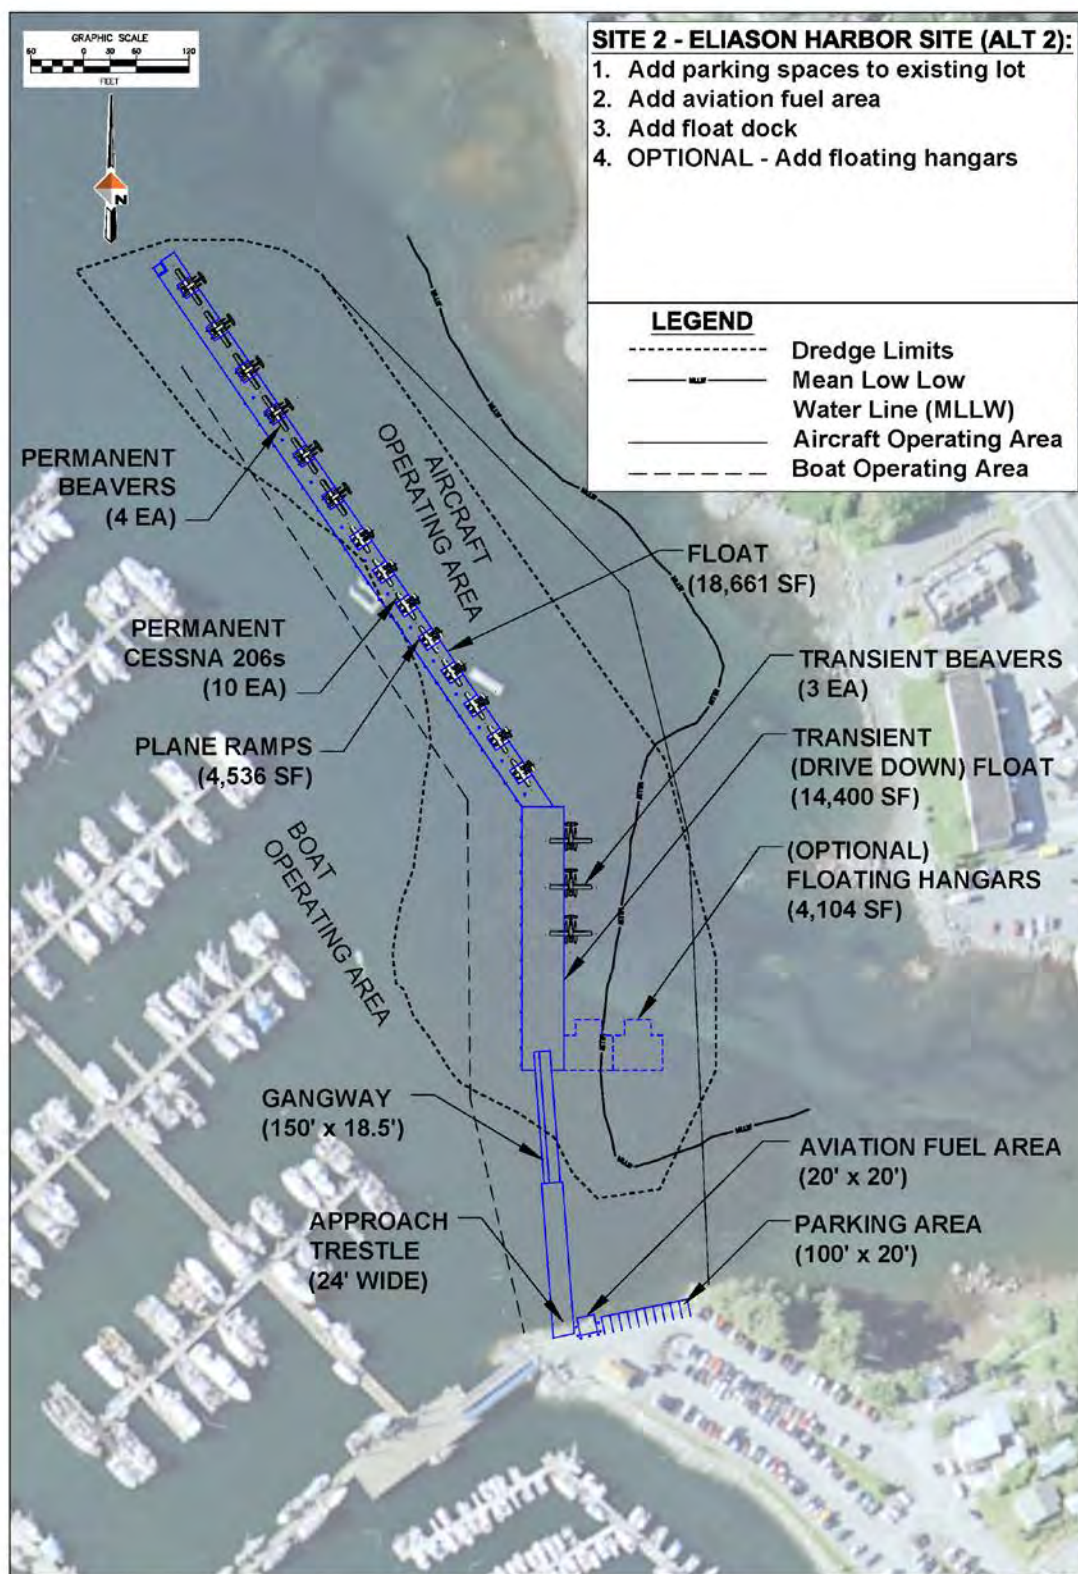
Alternative Layout 2 – Eliason Harbor Site
